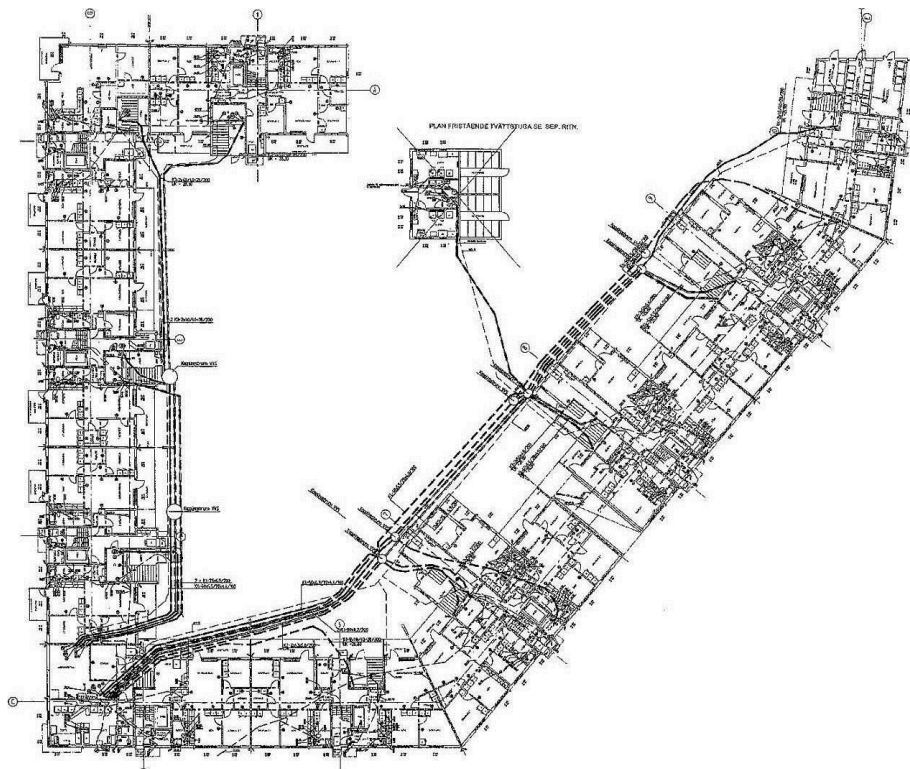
Buildings with an 800 meter long heating culvert placed outside of the building envelope (Bergqvist, 2011).
